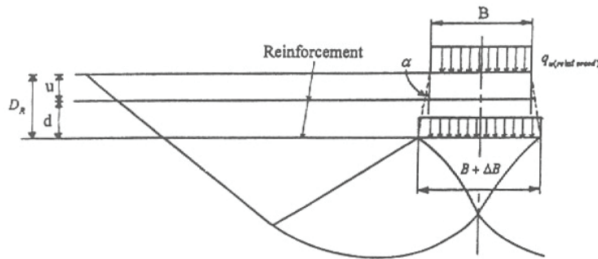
Failure Mechanism of Reinforcement Soil Foundation (Schlosser et al., 1983)
